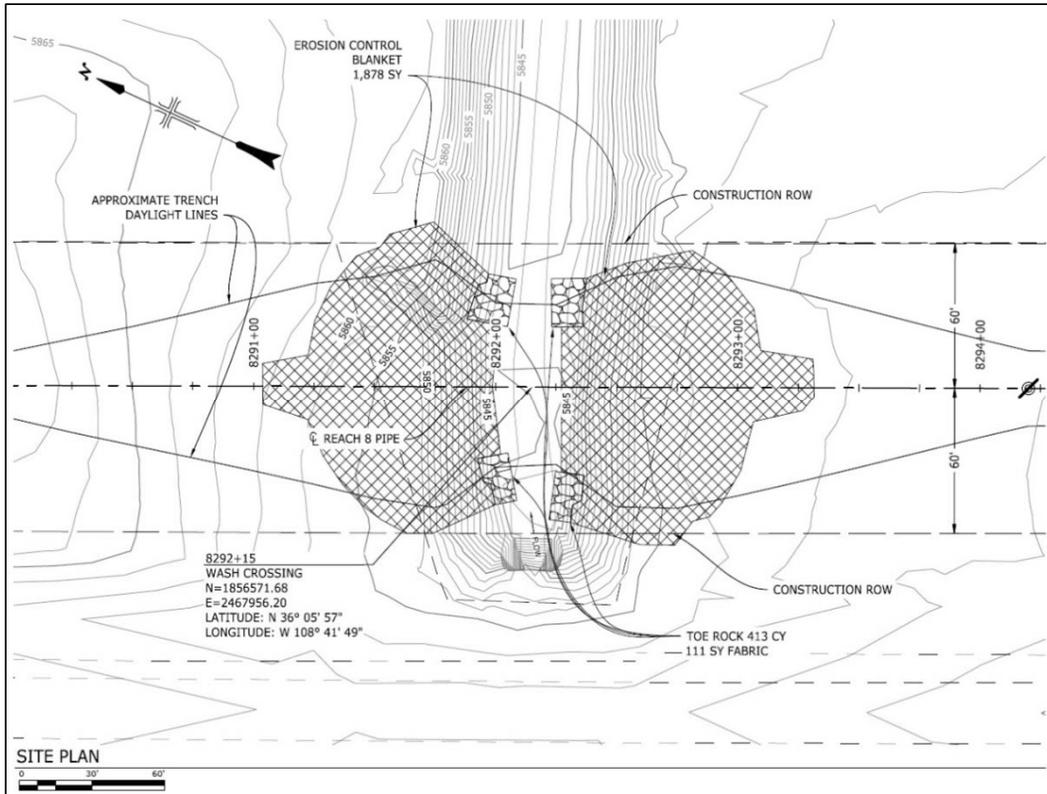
Typical bank treatment design at pipeline crossing for bank slopes steeper than 2.5H:1V. Note: surface diversion berms not shown.
